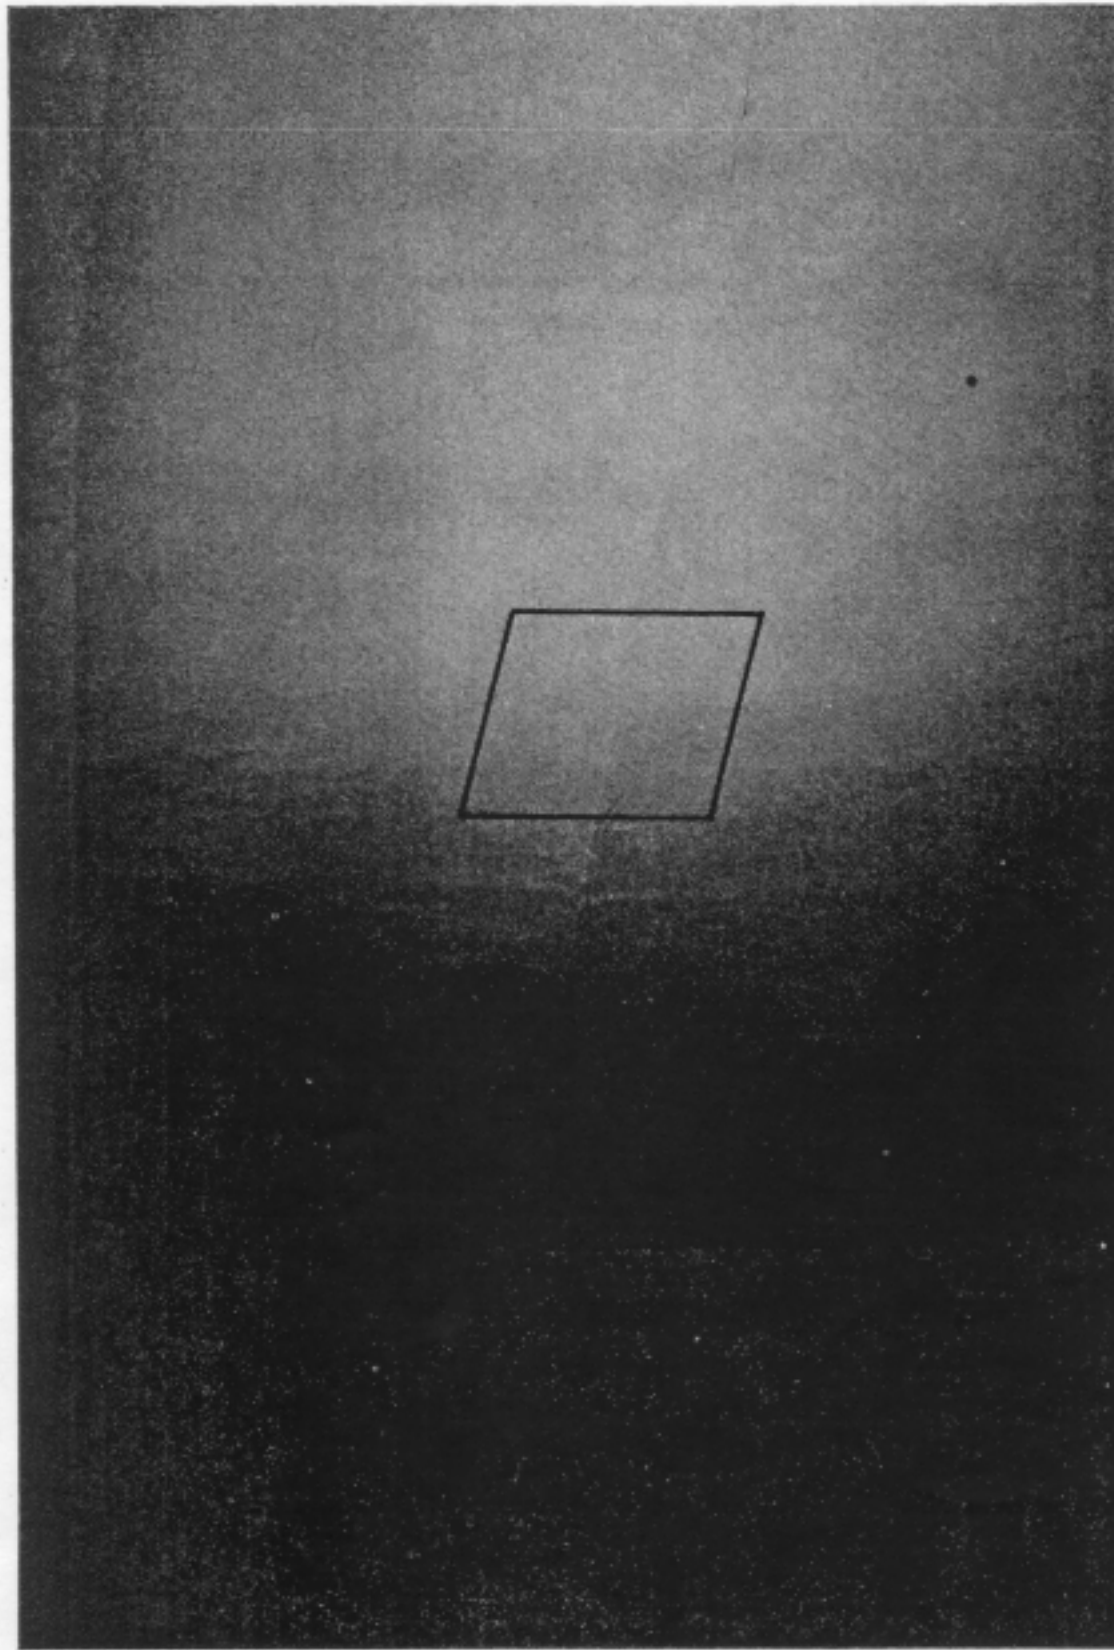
House of the Seven Gables (John Turner House), Salem, Mass. Rectangle drawn on photo of ceiling indicates area of X-ray seen in Figure 5. Note crack in the plastered ceiling, which suggested a structural displacement or alteration.
